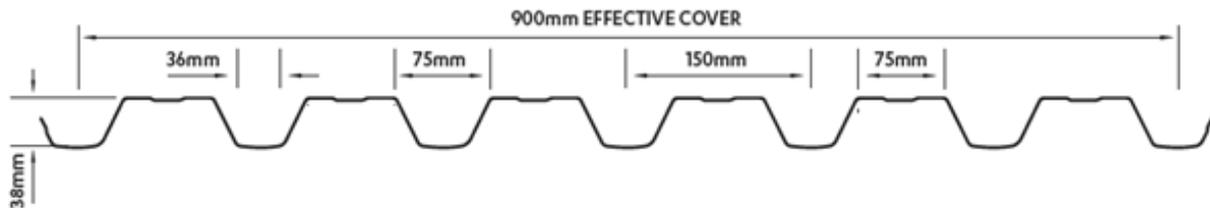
Existing ST900 profile (Note: Installed inverted as shown).
